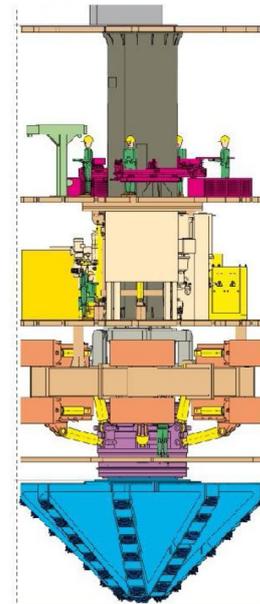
New Herrenknecht shaft boring machine for pilot hole-based projects
